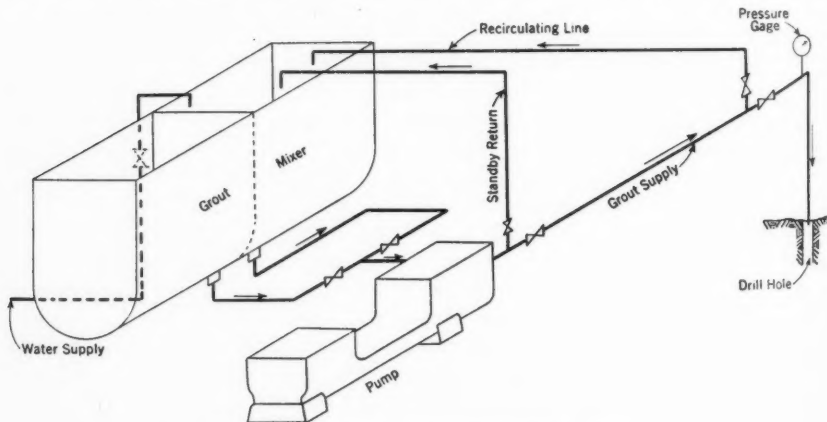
CIRCULATING ARRANGEMENT FOR GROUTING
